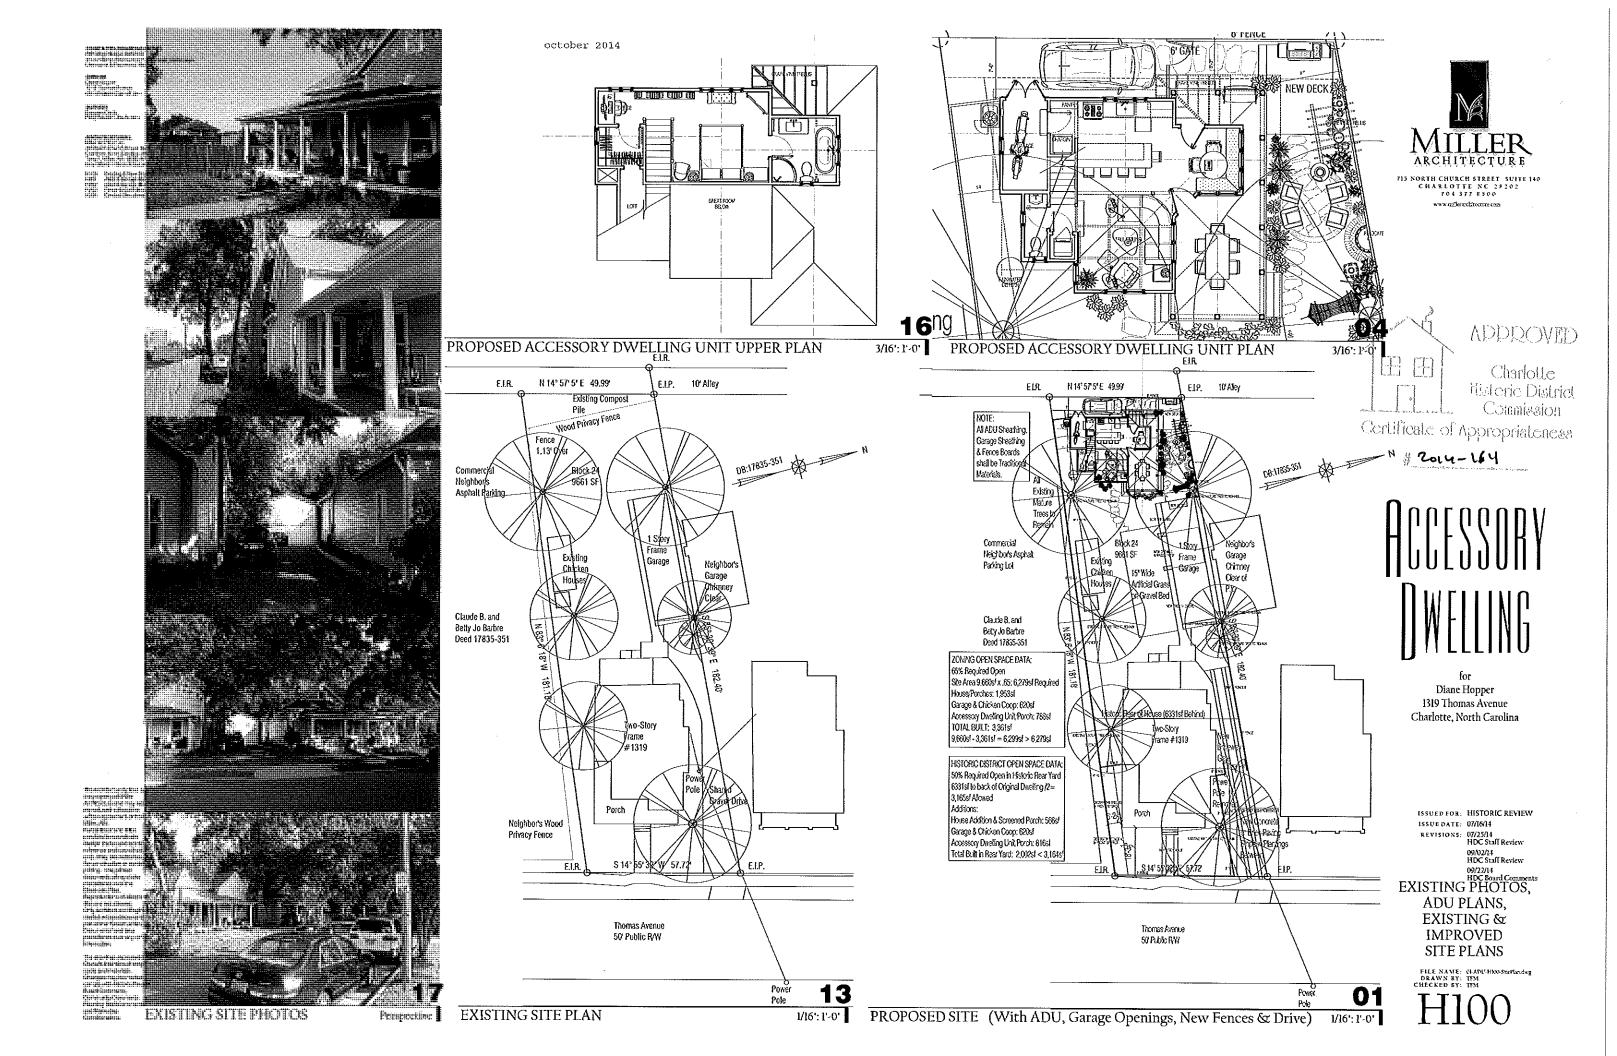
DETAILS OF APPROVED PROJECT: The project is construction of an accessory dwelling unit (ADU), driveway, fence, installation of an artificial grass surface in the rear yard and improvements to the existing garage. The ADU height is approximately 25'-6" with materials and design details to reflect the principal dwelling. The existing alley will provide access to the ADU. The existing garage will have new siding and windows. A new canopy will be constructed over the garage door. The new fence will be detailed as drawn and will not exceed 6' and 4' along the rear and side yard. See attached plans for details.
